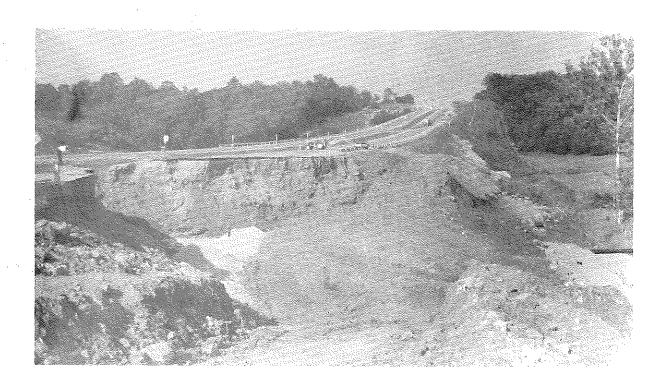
Free-draining, Granular Blanket and Pipe Outlet.
